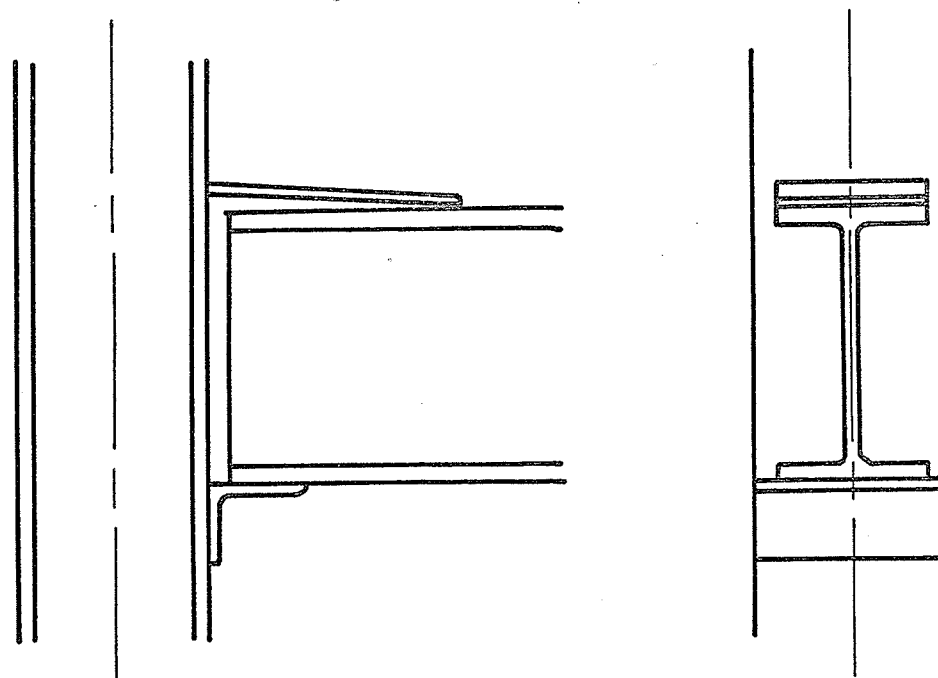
WELDED TOP PLATE AND SEAT CONNECTION
